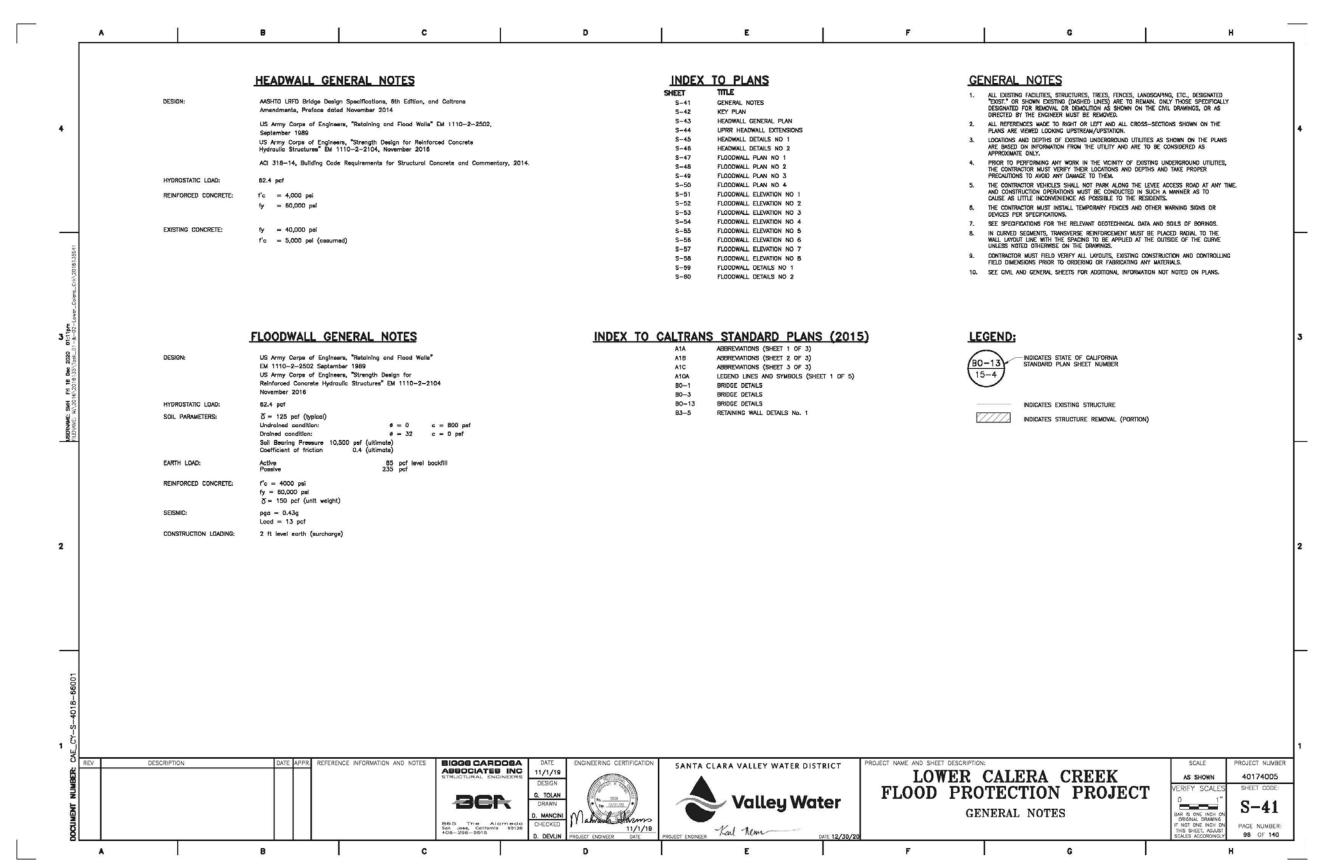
EXHIBIT E LCC Headwall Structure at North Milpitas Boulevard and Arizona Avenue Bridges
